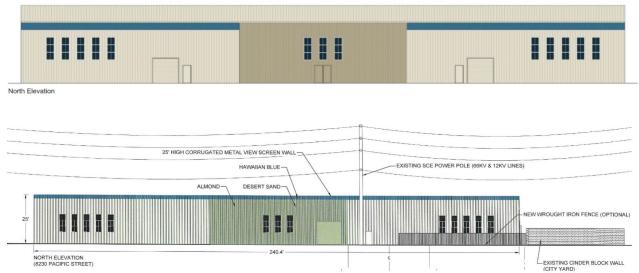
Proposed Buildings - Top: North Elevation (original proposal). Below: North Elevation (current request)
